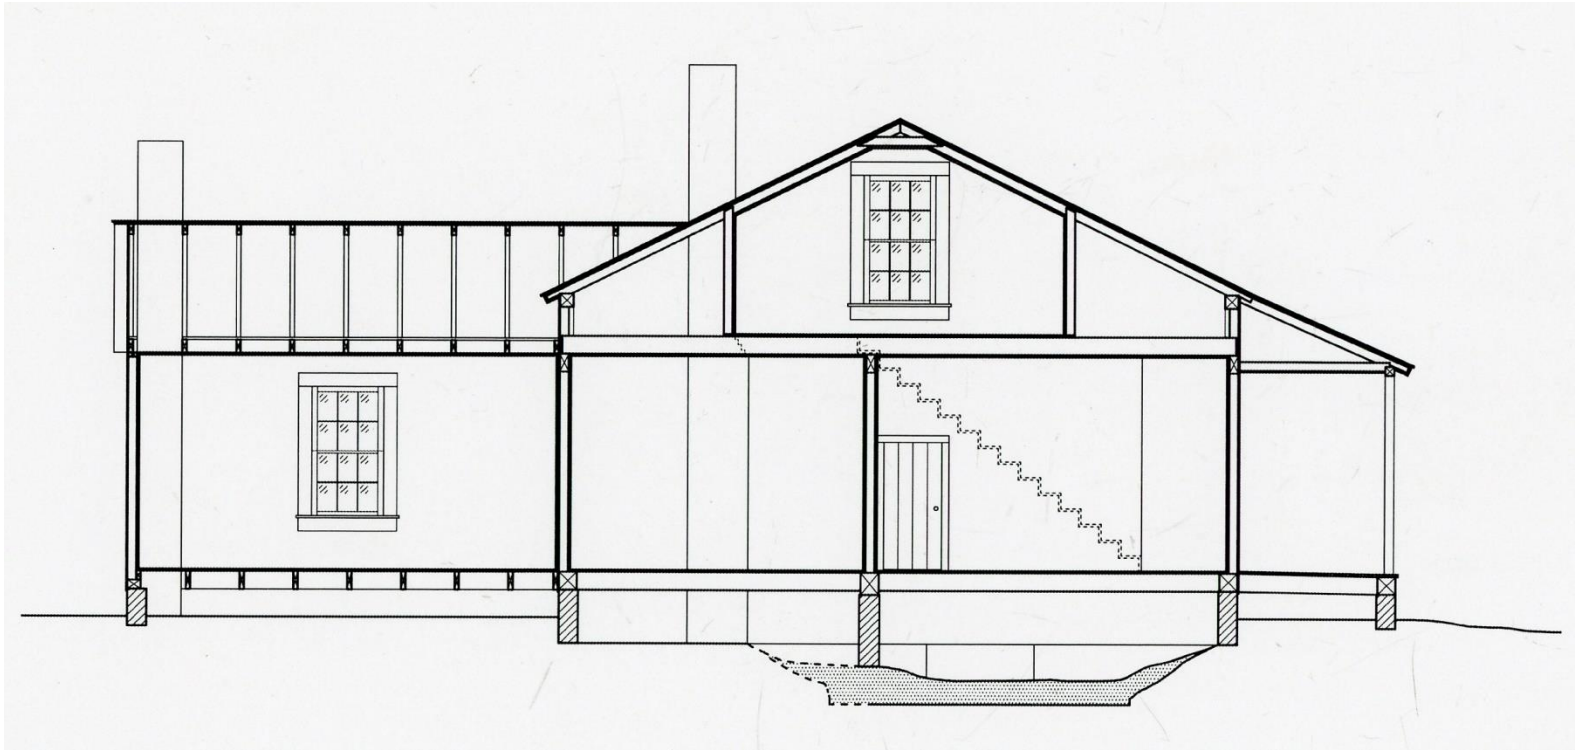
Conjectural sectional view of House E, looking north through the southern half of the house, circa 1870 (after construction of rear addition. By this date, the cellar beneath the original section of the house appears to have been abandoned and begun to be infilled with household debris. The earthen walls of the cellar also had been eroded.
